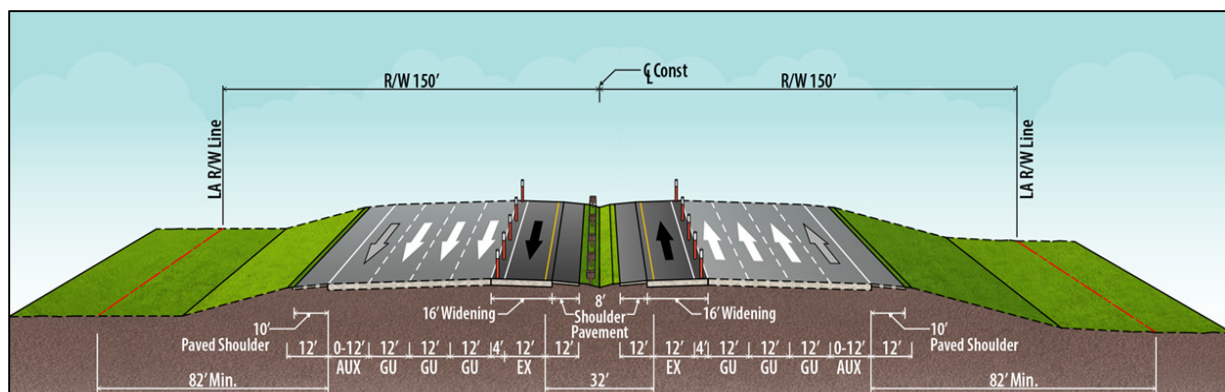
I-275 Mainline Master Plan Build Alternative Typical Section from north of 4th Street North to 1.0 mile south of the Howard Frankland Bridge (Segment C-MP4)
